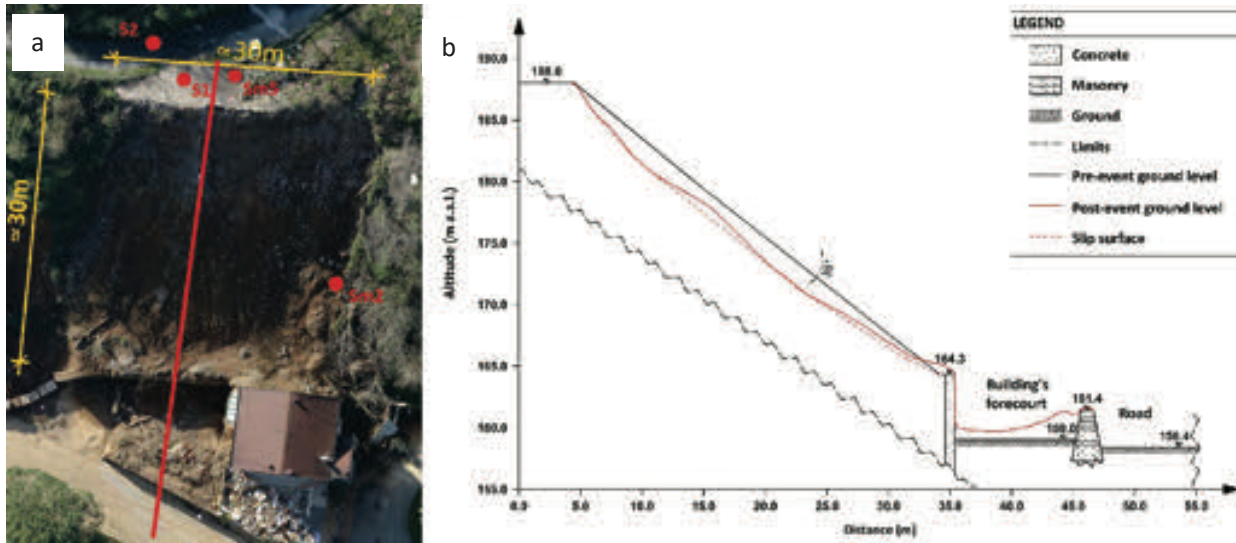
Landslide geometry: orthophoto with dimensions and track of cross section (a); cross section (b)
